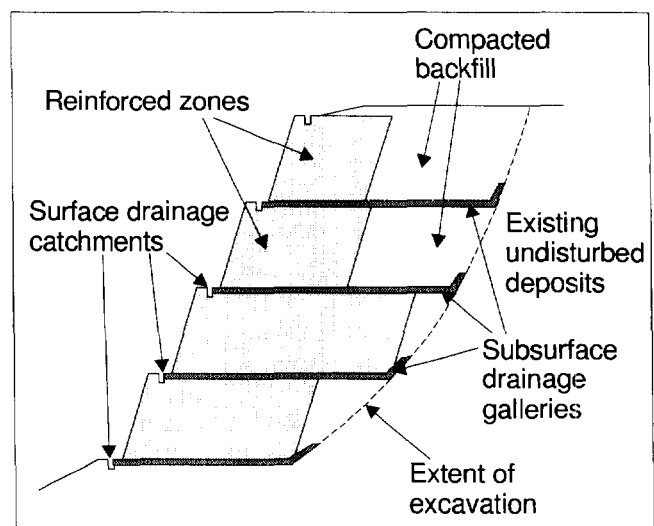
Recommended layout of drainage system within high, reinforced slopes.
